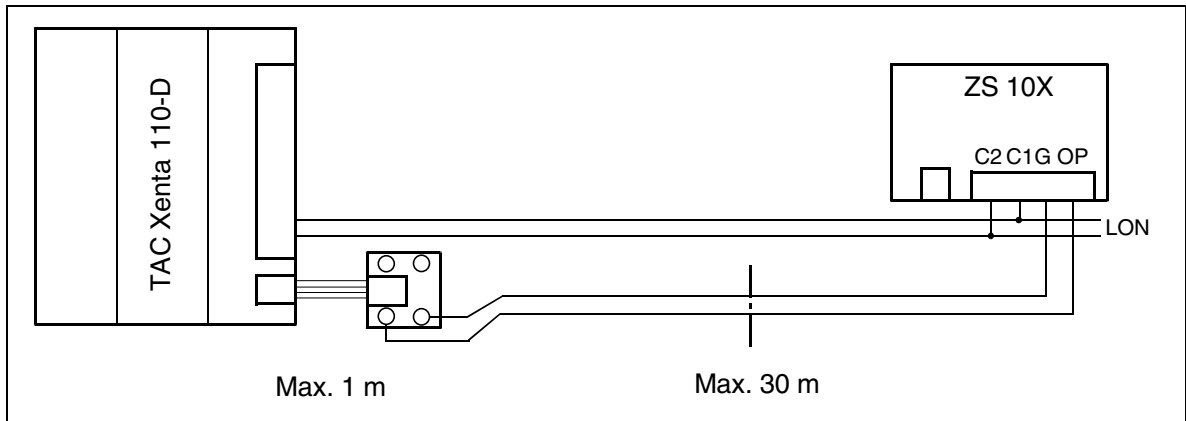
TAC Xenta OP to wall module connection, , alternative 2
